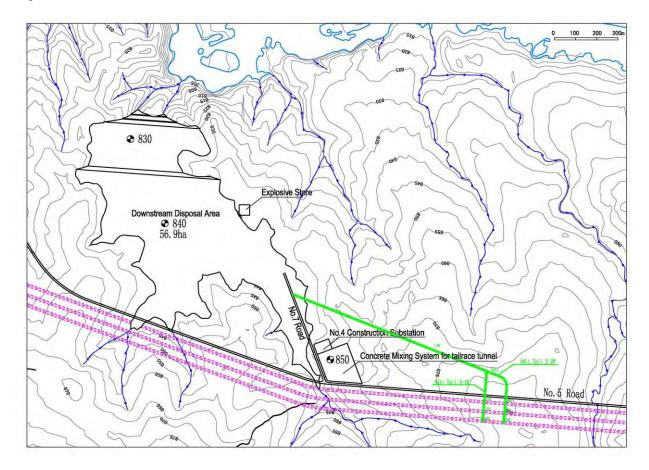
Tailrace Tunnel Construction Area Layout Plan
